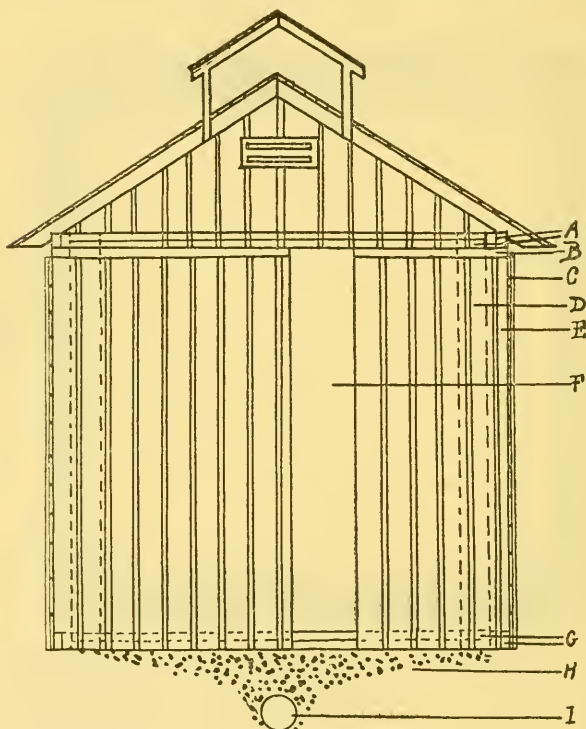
Well-built farm ice house. Elevation: A, plates; B, 6-inch open space between weather boarding and plates; C, weather boarding; D, posts (shown in dotted lines); E, studs; F, opening for ice; G, sills; H, gravel for drainage, I, tile.
